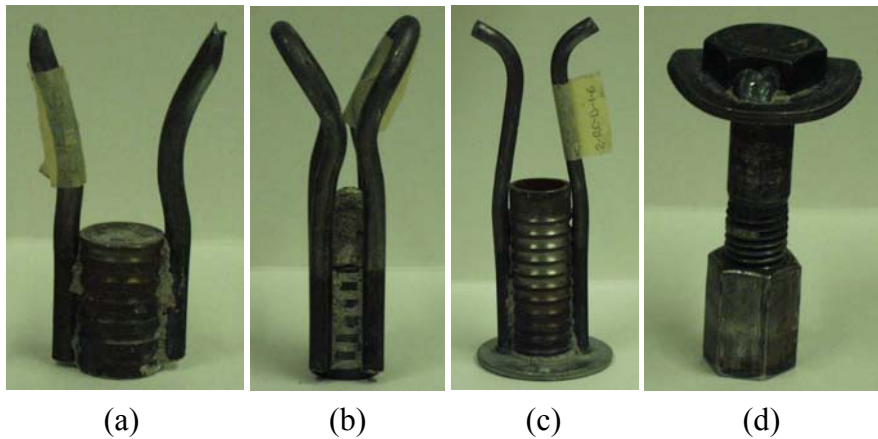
Typical deformation patterns for the inserts in reinforced pull-out tests specimens: (a) loop insert; (b) thin-slab insert; (c) double-leg insert; (d) bolt-type insert.
